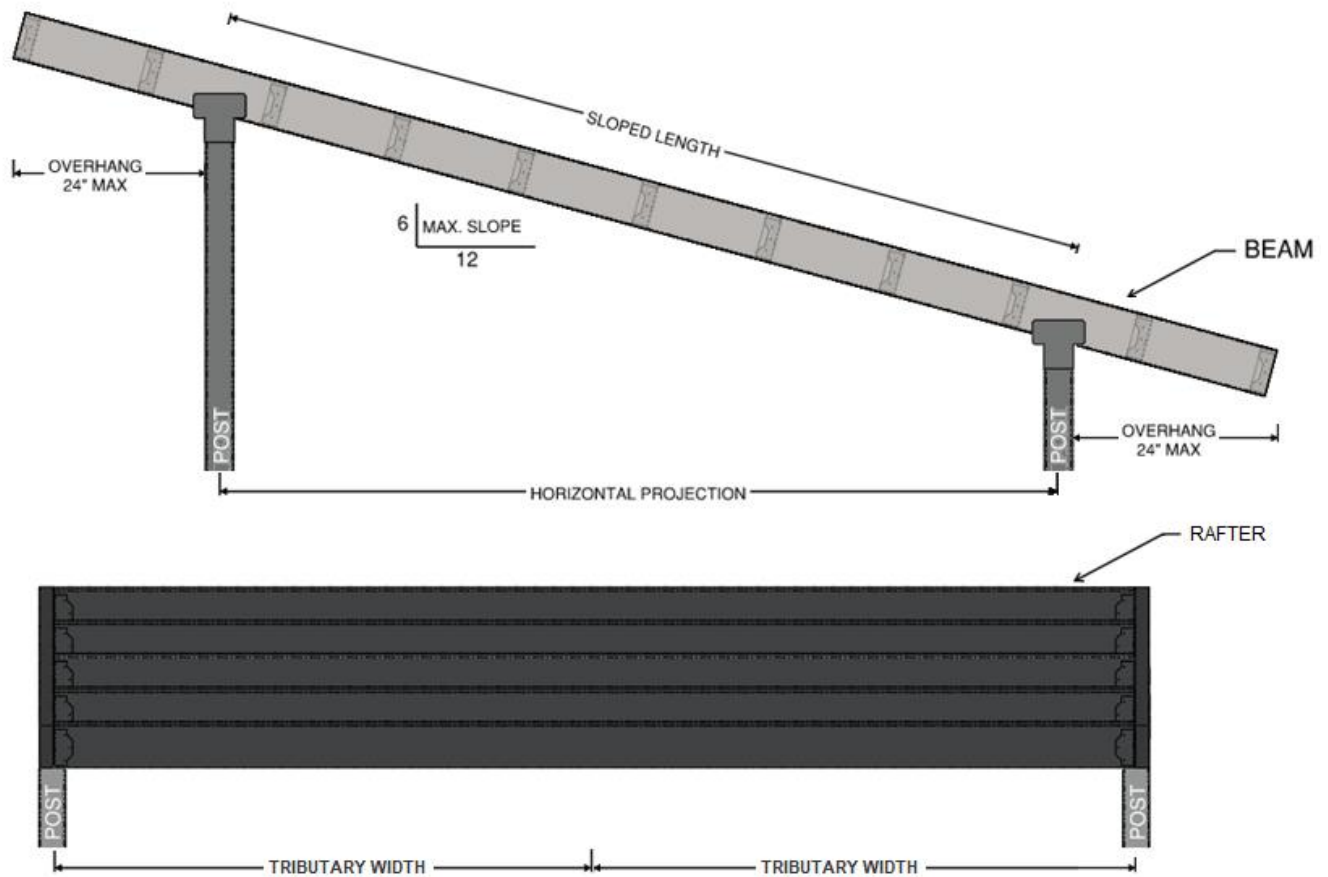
Rafter and Beam Span Definitions for Freestanding Sloped Beams Roof Framing
